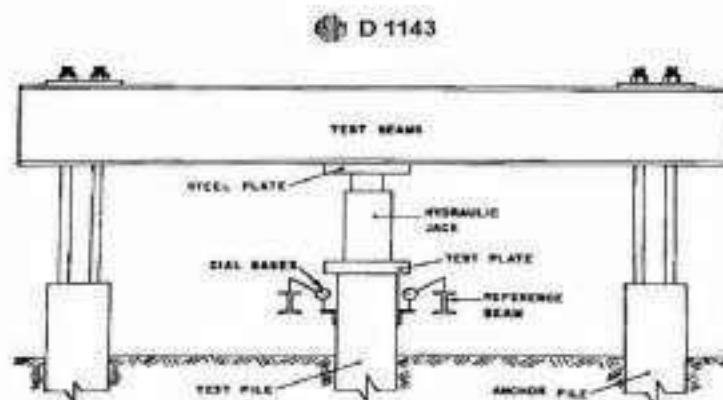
Schematic Set-Up for Applying Loads to Pile Using Hydraulic Jack Acting Against Anchored Reaction Frame
